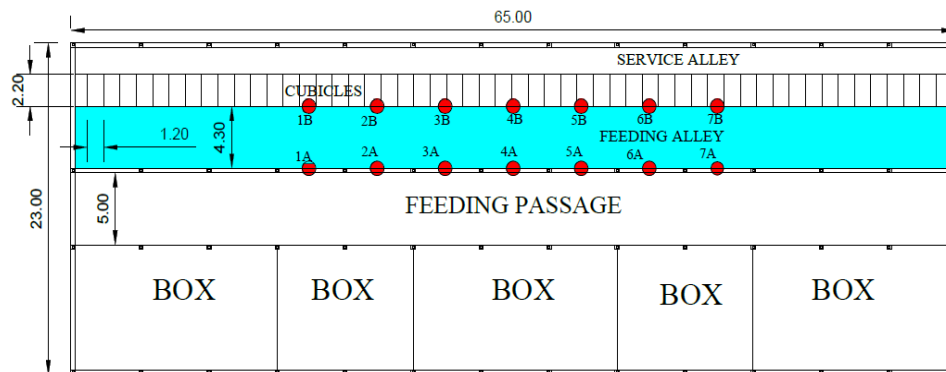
Floor plan of Building B and sampling points located in the functional areas.
